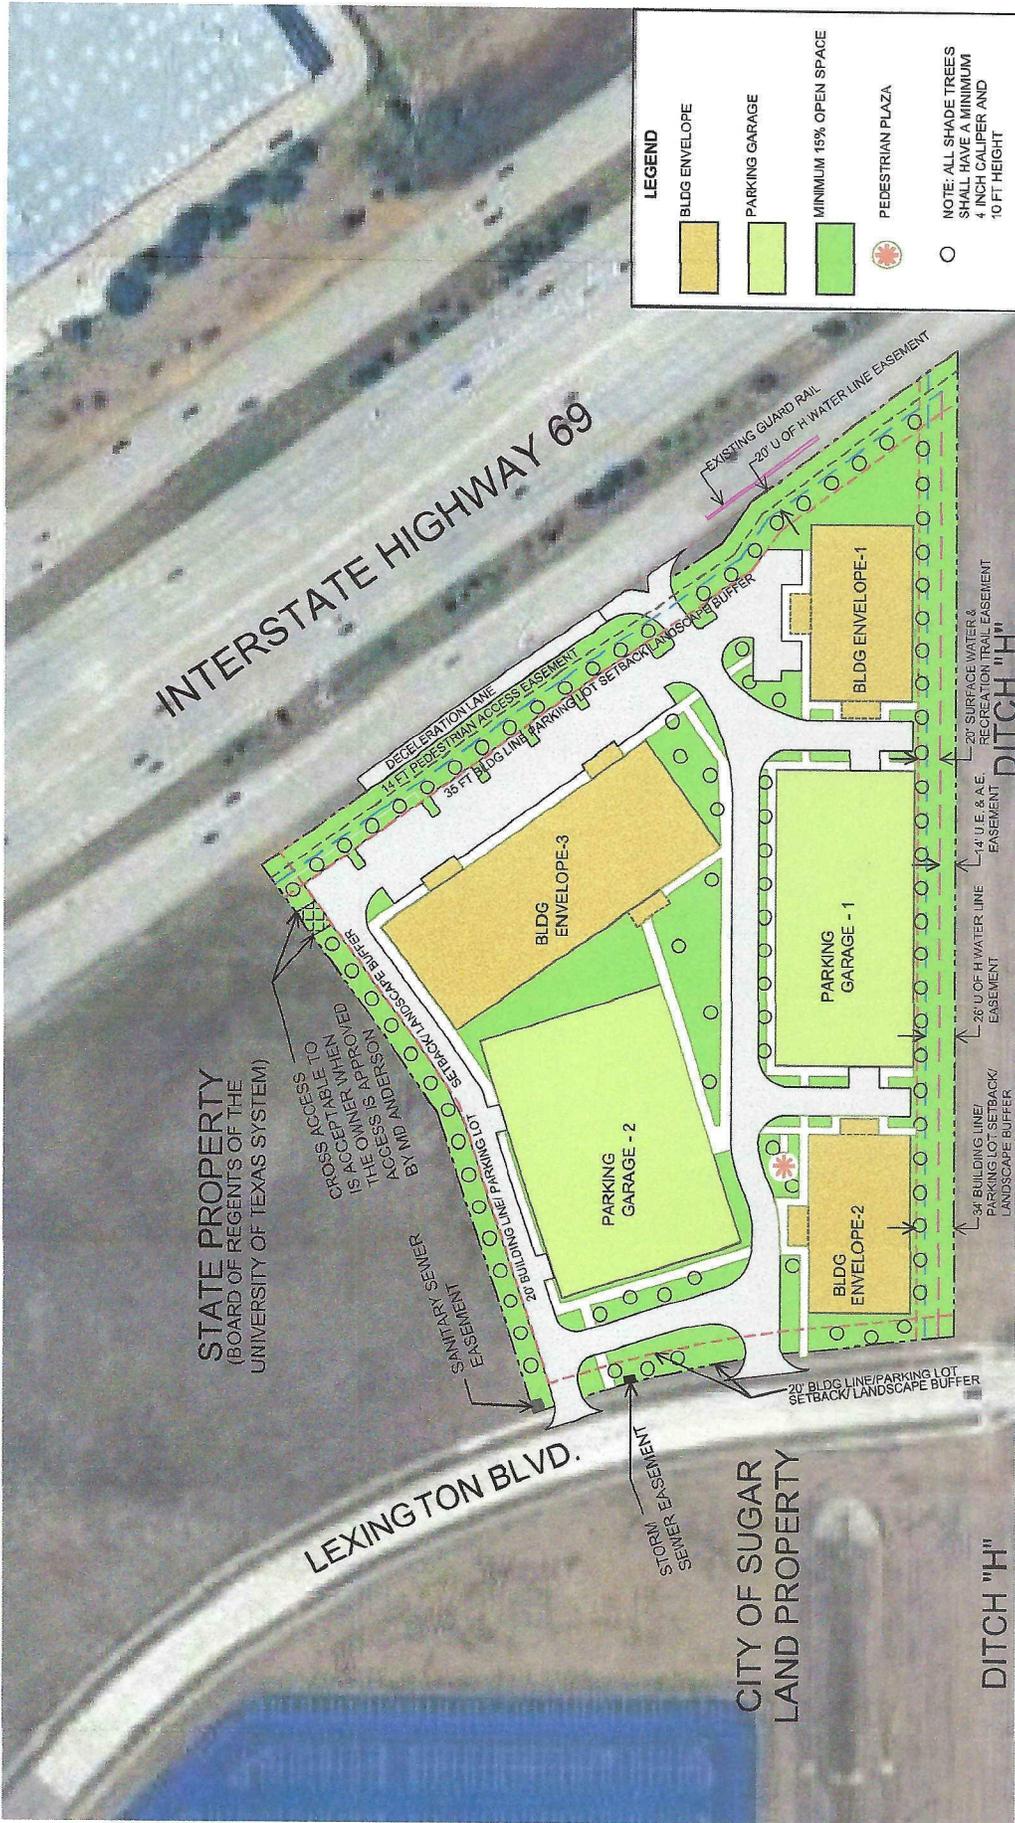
T: LEXINGTON COMMONS LANDSCAPE PLAN, INCLUDES TXDOT CURB CUT
